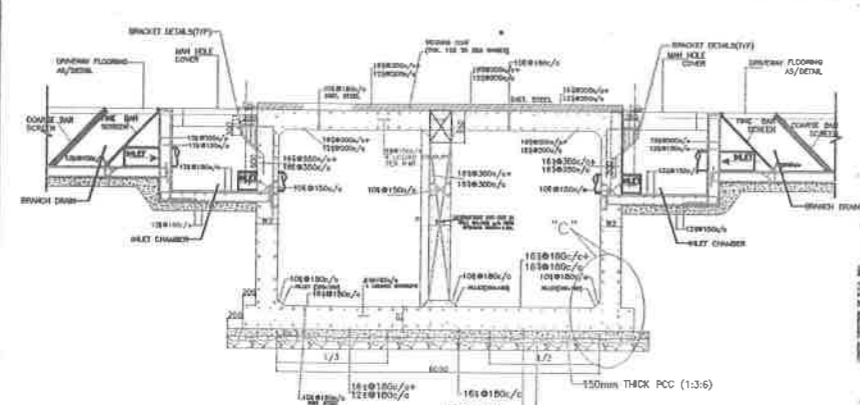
DETAILS FOR RCC DRAIN STRUCTURE (FOR CLASS B LOADING)
